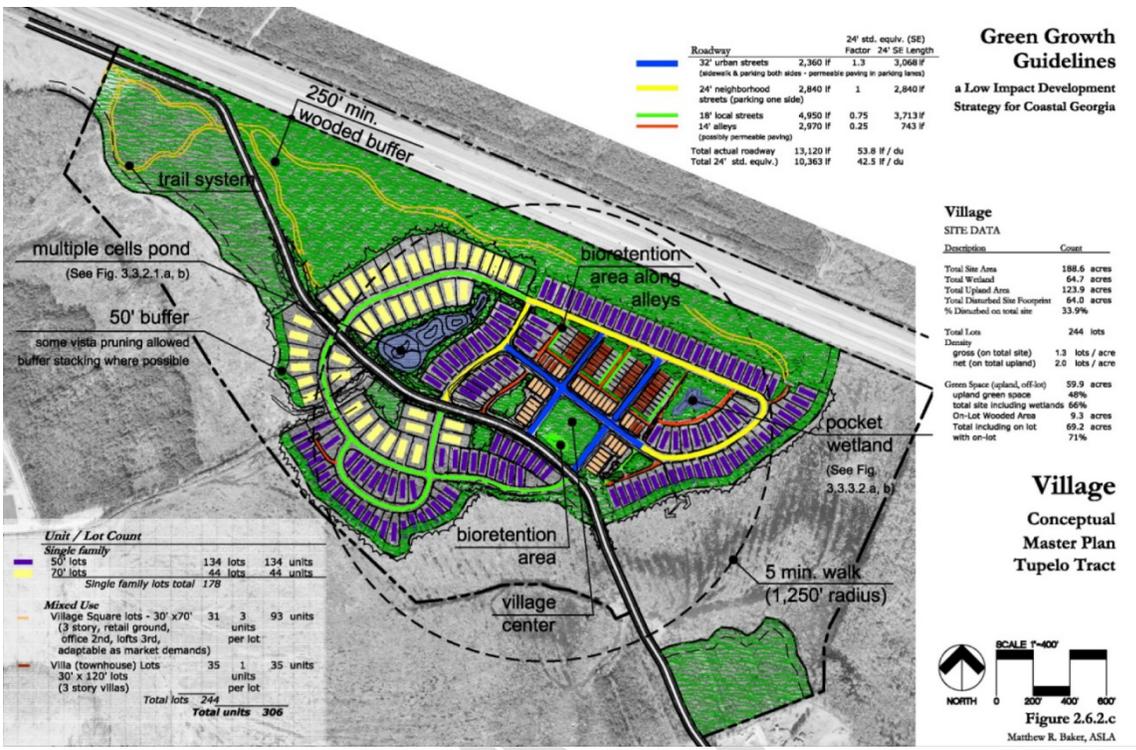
New Urbanist Site Design (source: Merrill et al., 2006).
